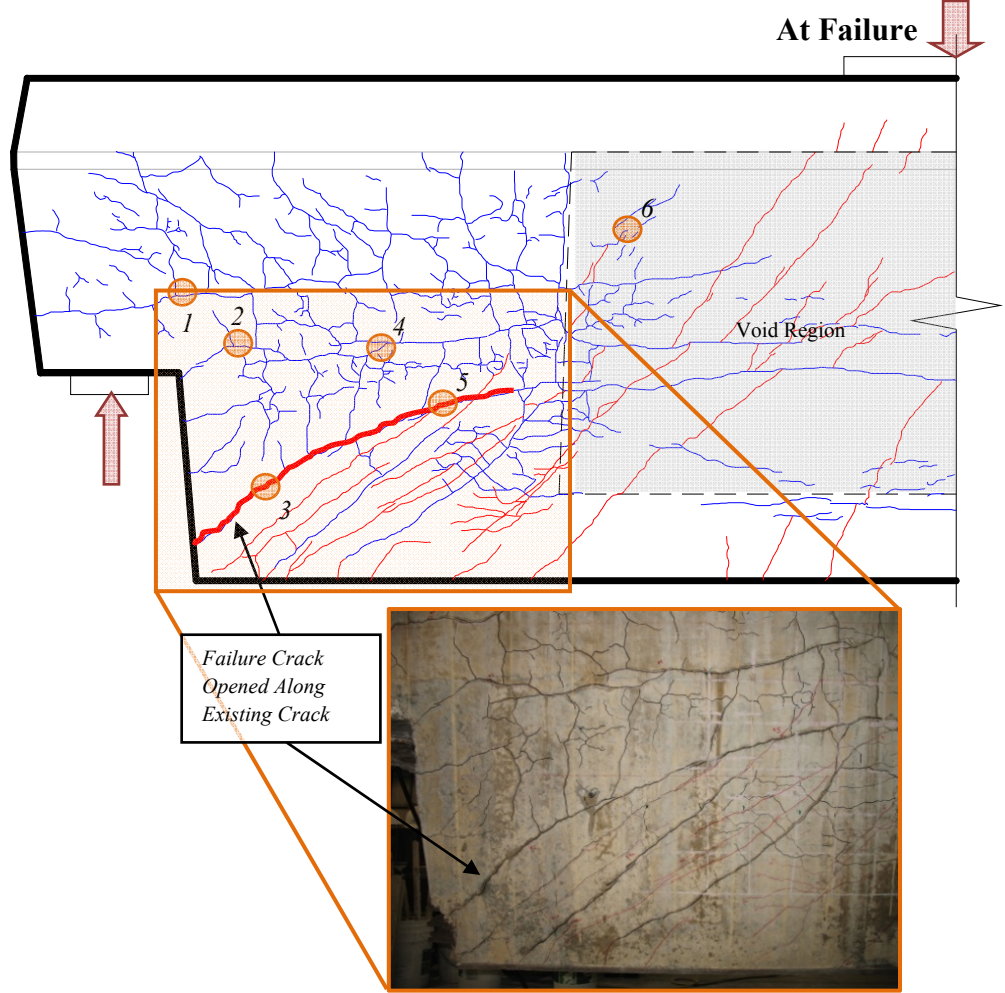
Cracking on the west side of beam RF-3R-9(c) after failure.
